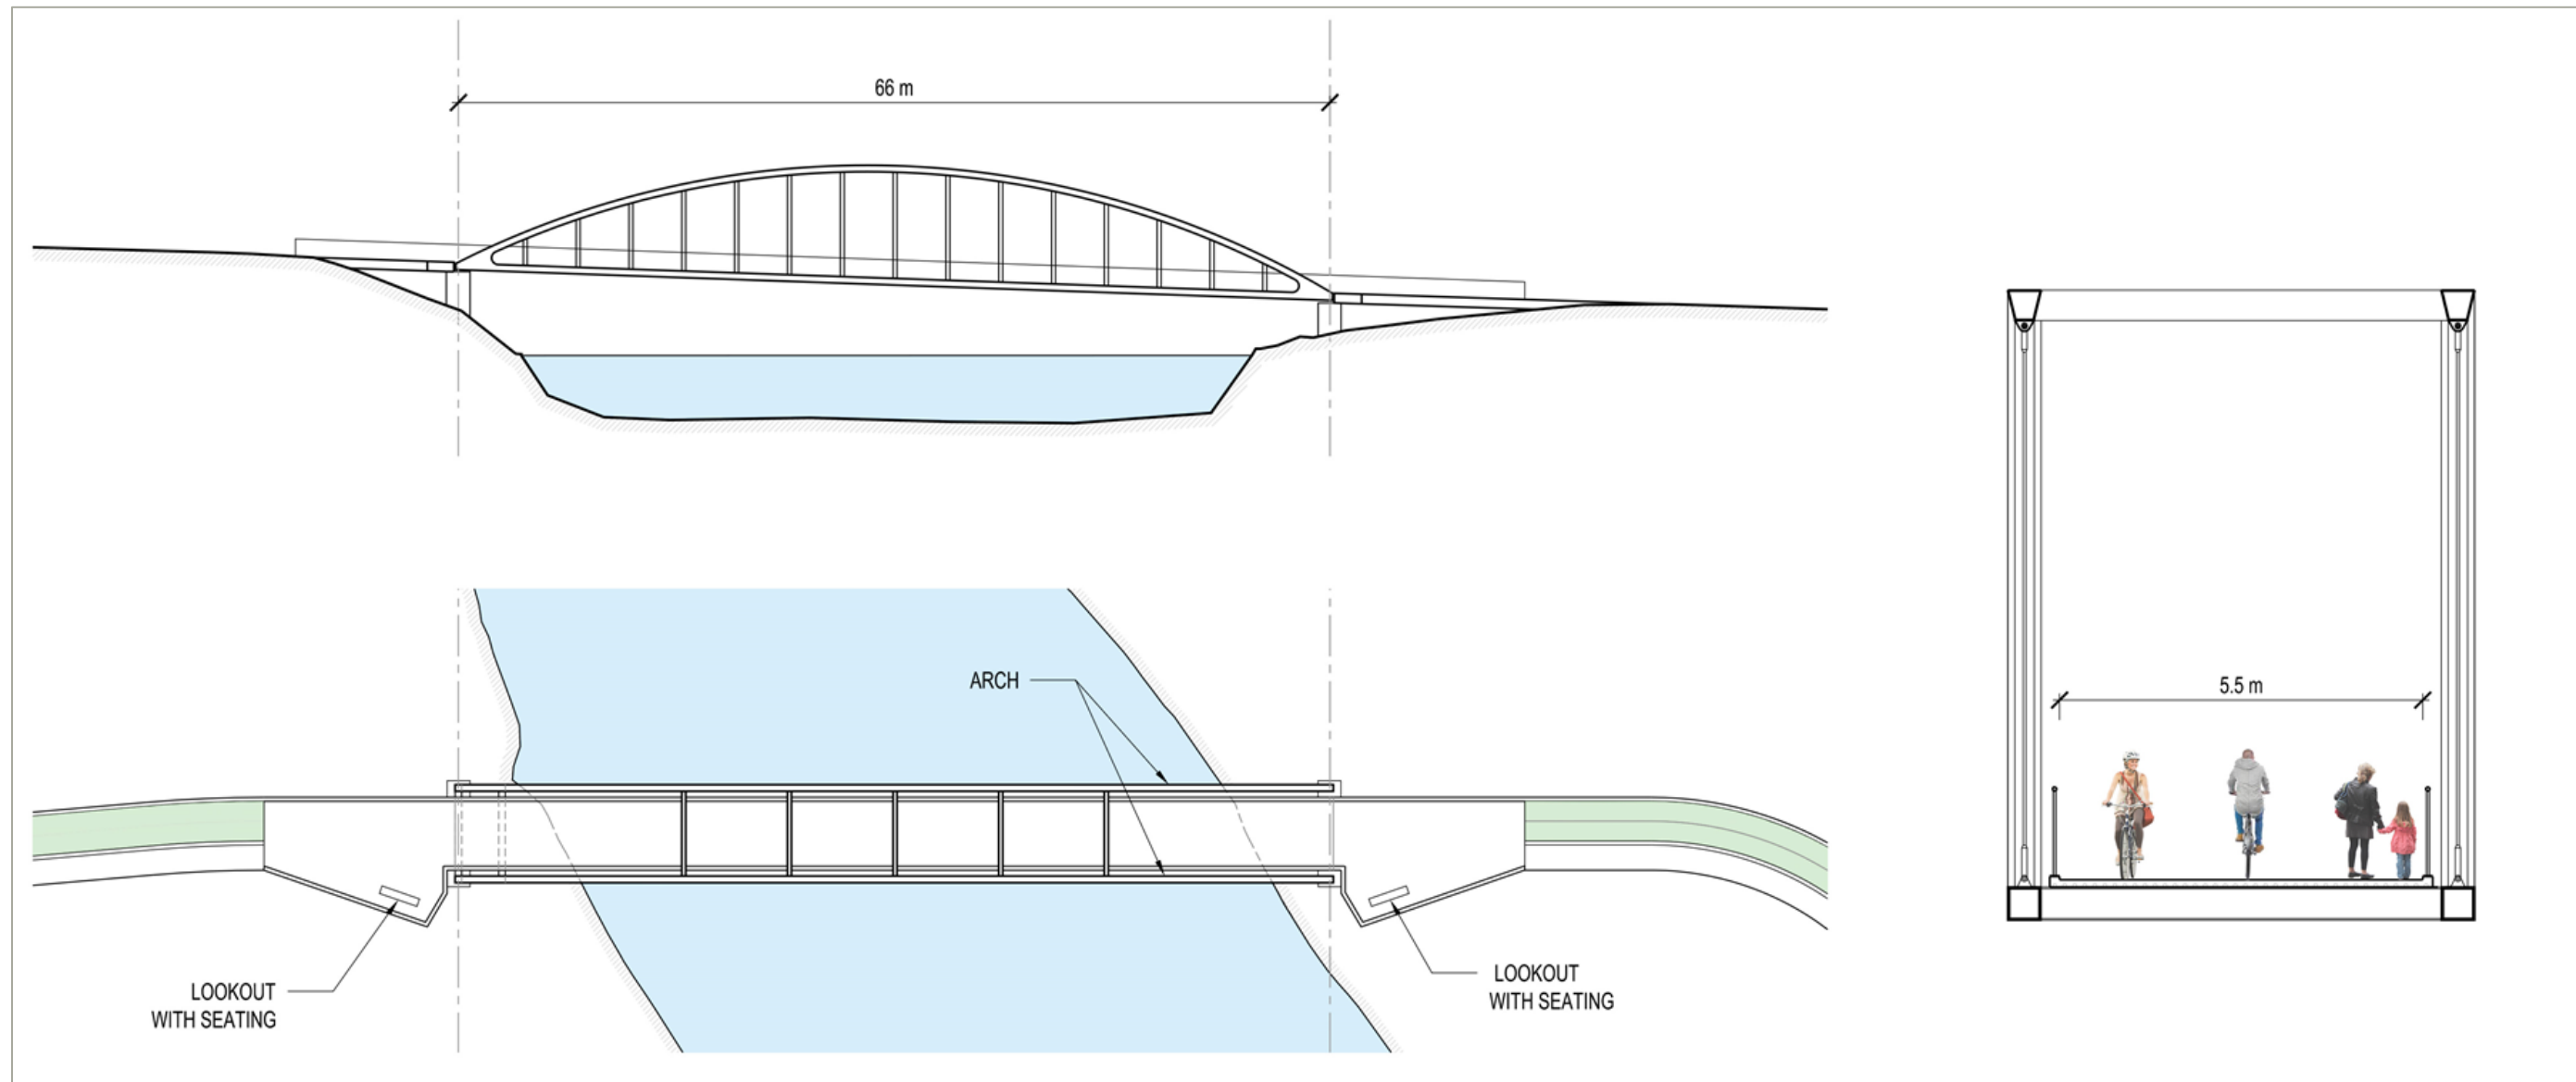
Conceptual Renderings of Above-Deck Arch Bridge
